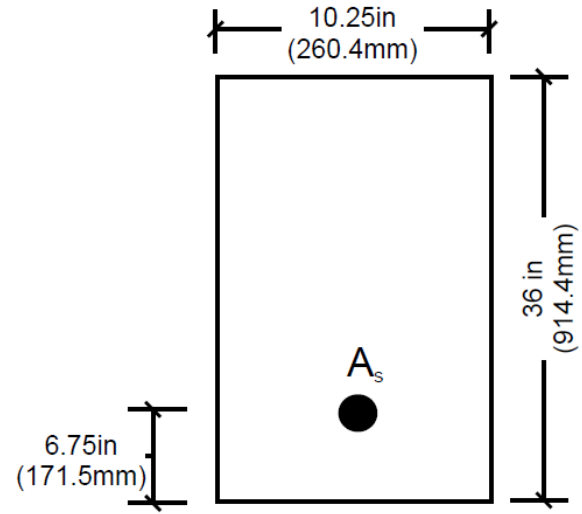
Cross-section of undamaged prestressed girder modelled in Abaqus
